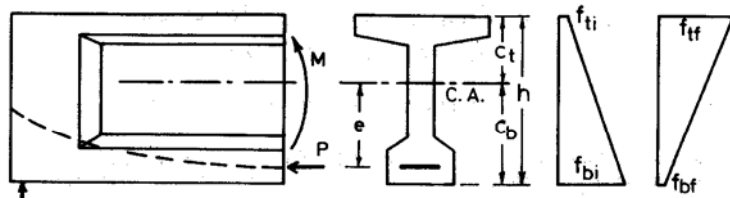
Prestressed Concrete Beam: Half Longitudinal Elevation, Cross Section, Initial Distribution, and Final Stress Distribution
